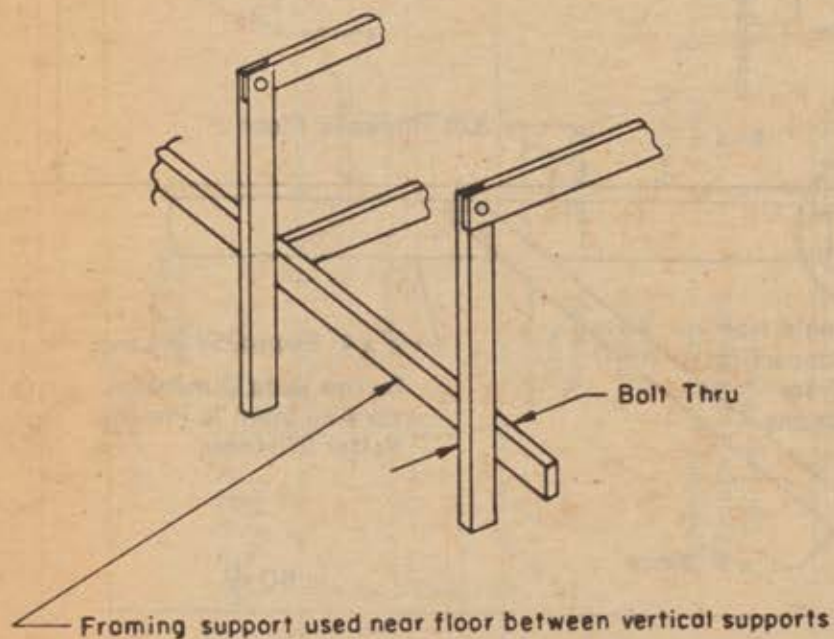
Details of Tunnel Framing and Wall Panel Attachment
